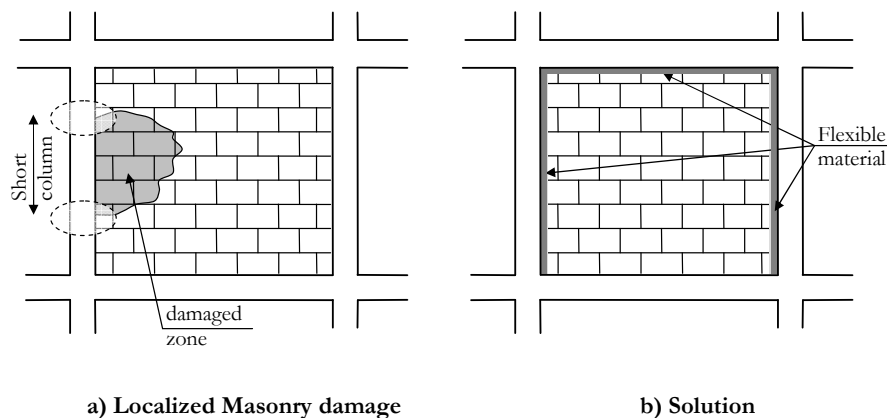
Restriction to deformation of the structure due to non structural masonry wall and possible solution
